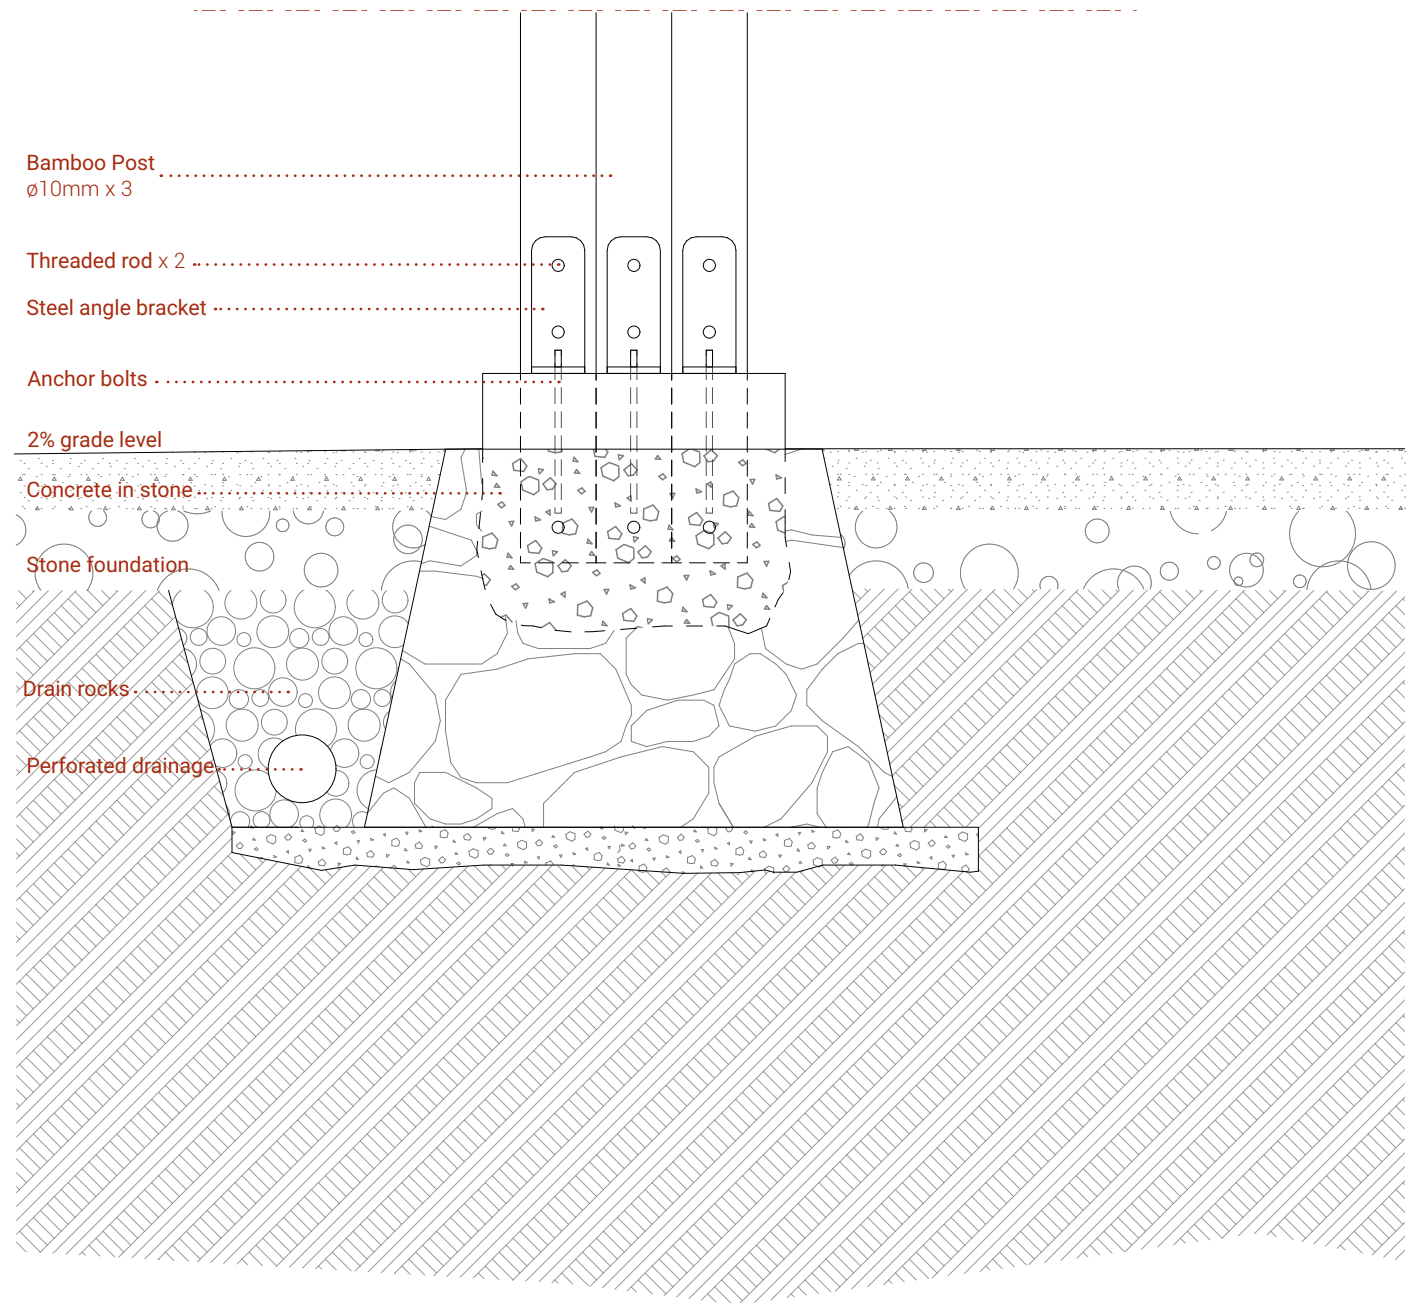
Detail B - Bamboo Post Foundation, 1:10
